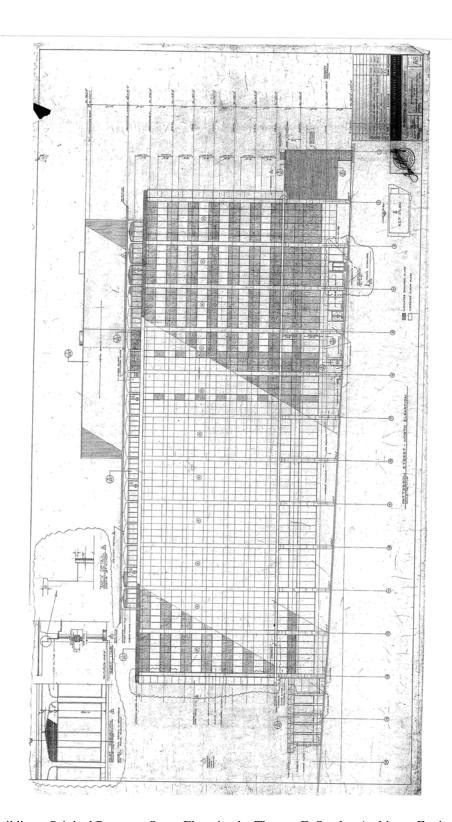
Mayflower Building - Original Patterson Street Elevation by Thomas E. Stanley Architects Engineers, dated May 1964.
